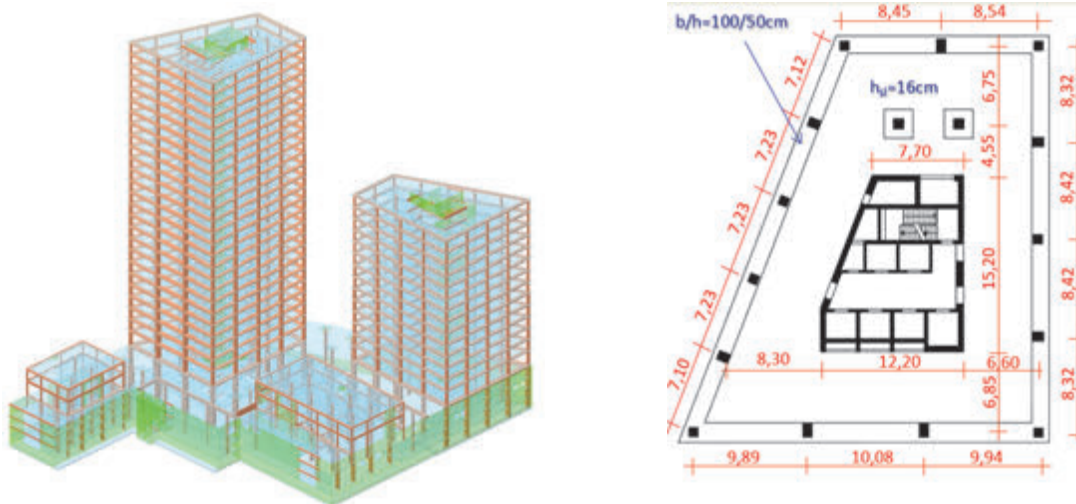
3D structural model of concrete load-bearing structure (left) and tower B typical floor plan (right)
